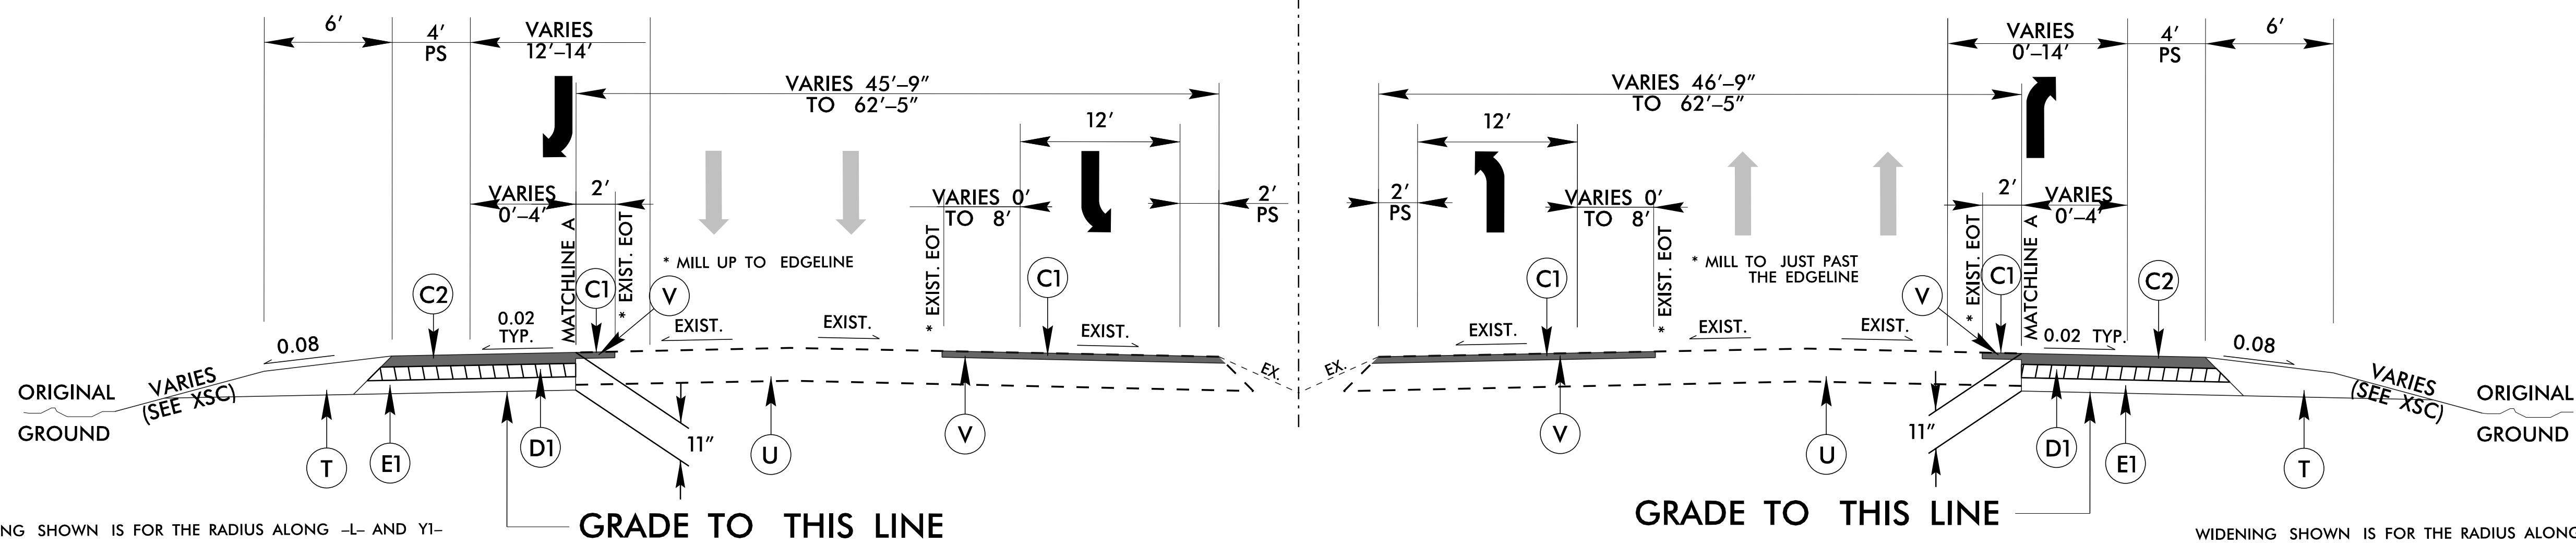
DETAIL OF INCIDENTAL MILLING PAVEMENT TIE-IN
